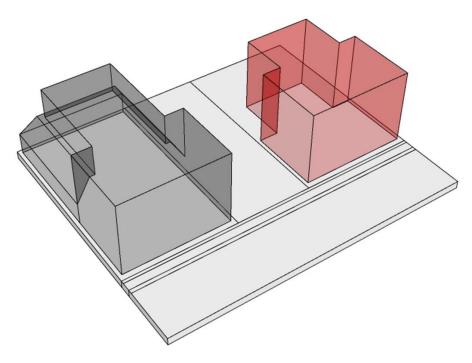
Recommended building envelope wide site – not limited by site coverage (left) and limited by 50% site coverage (right).
